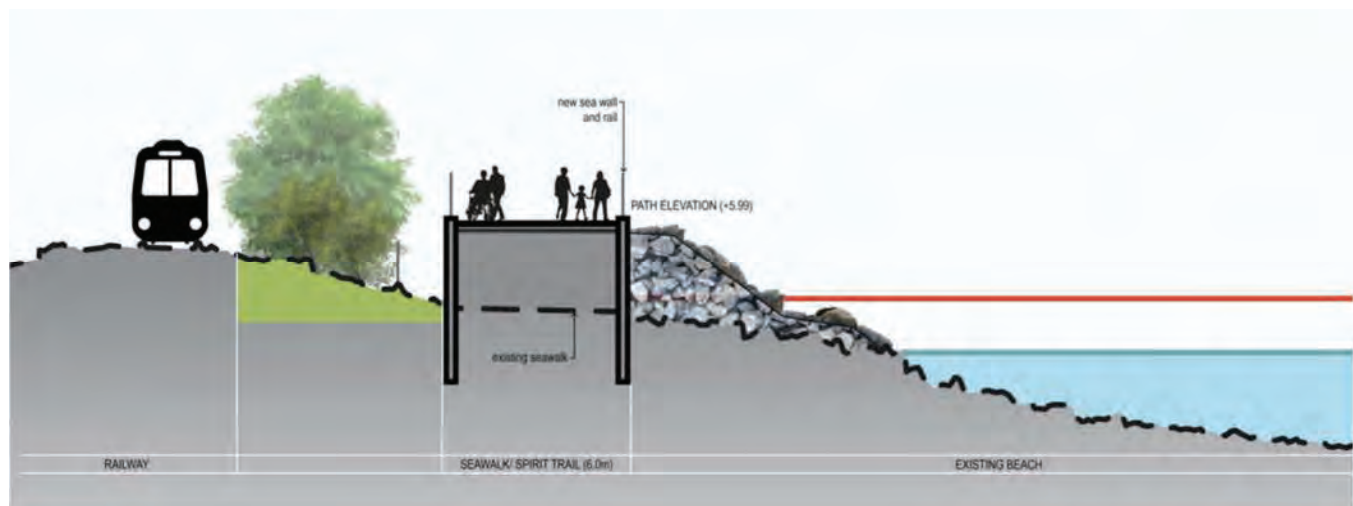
Proposed Cross Section –Structural seawalk with rock armour protection
